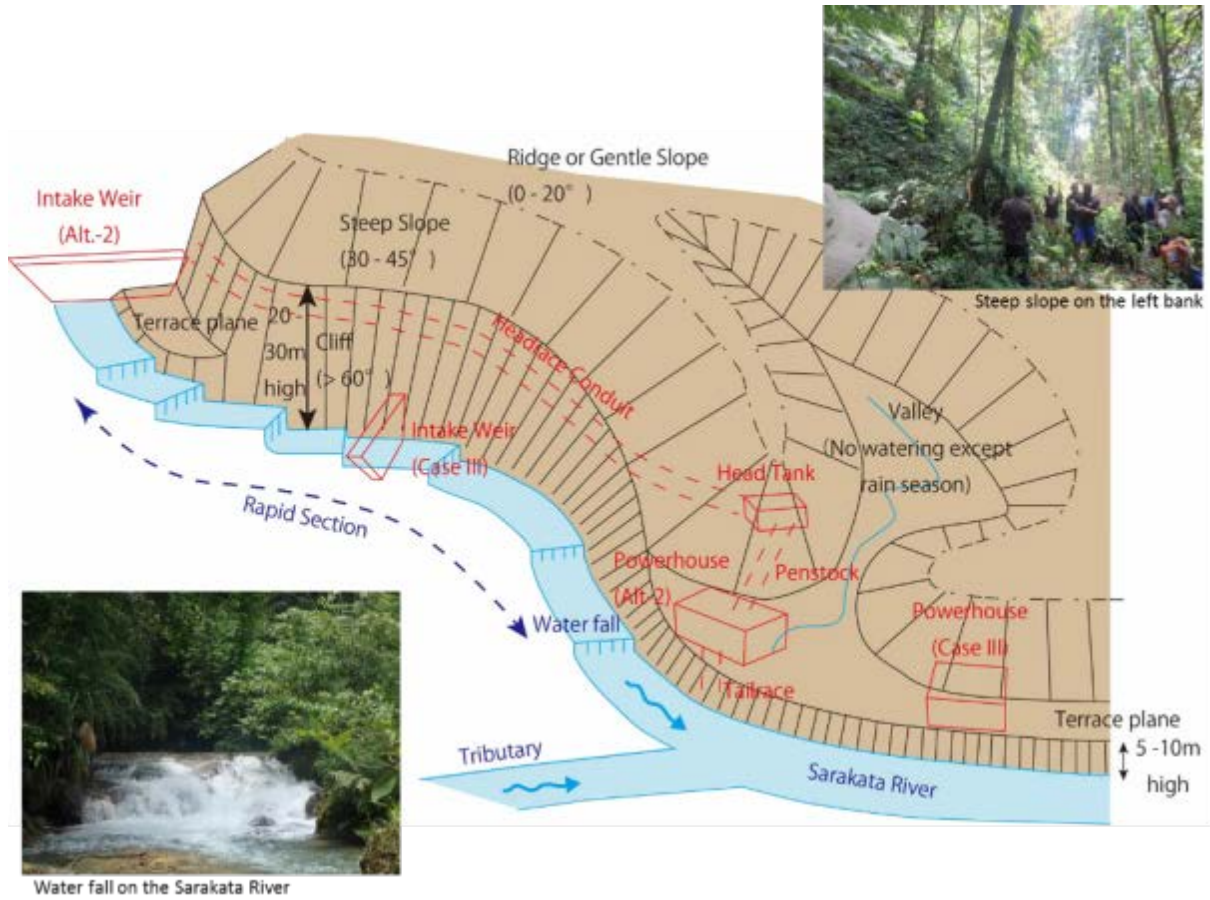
Conceptual Layout of the Hydropower Project
